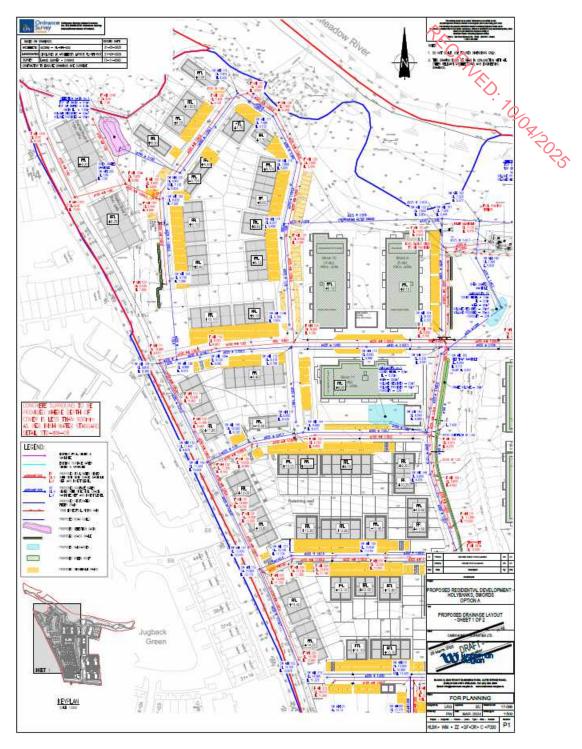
SURFACE AND FOUL WATER DRAINAGE (WESTERN) (TOWNHOUSE) (DRG NO. P200, WATERMAN MOYLAN 2025).
